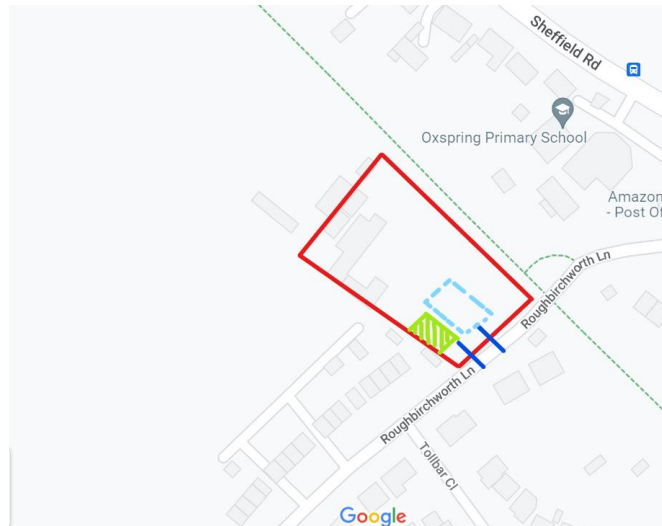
Unloading Zone near site entrance (will be developed as site road is installed)
